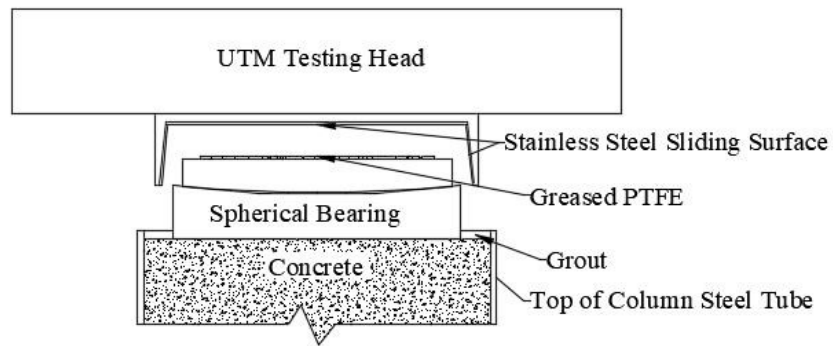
Axial Bearing Assembly for Specimens 48-21, 30-21-R, and 30-21-LD
